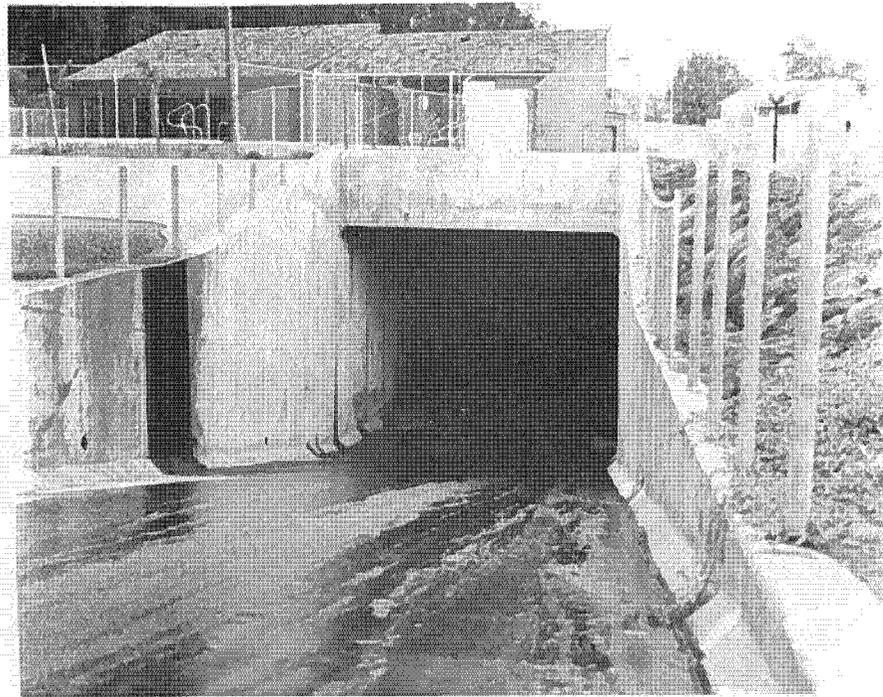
Upstream end of an extended culvert on Kawa Stream at Kaneohe (modification type 6). This structure is located in the Parkway subdivision.
